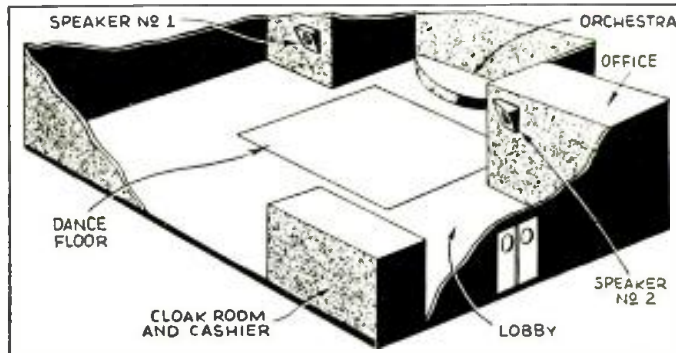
Two wall-type speakers project sound beyond the dance floor of a New York restaurant.
